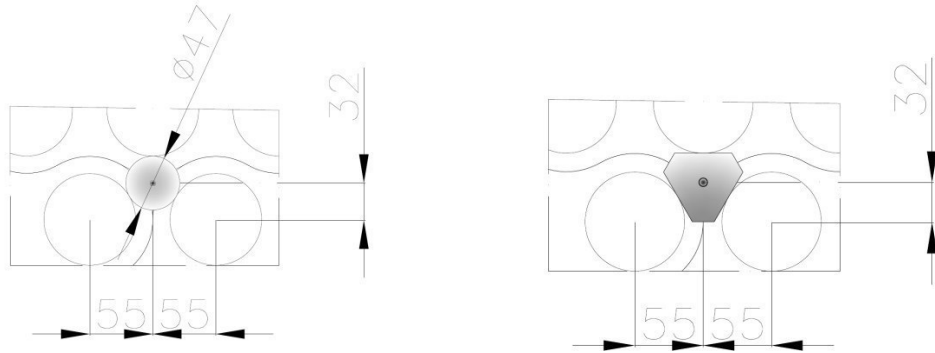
Details of anchorage system using Hilti anchor HUS-H 8mm with circular plate (left) and with triangular plate (right).
